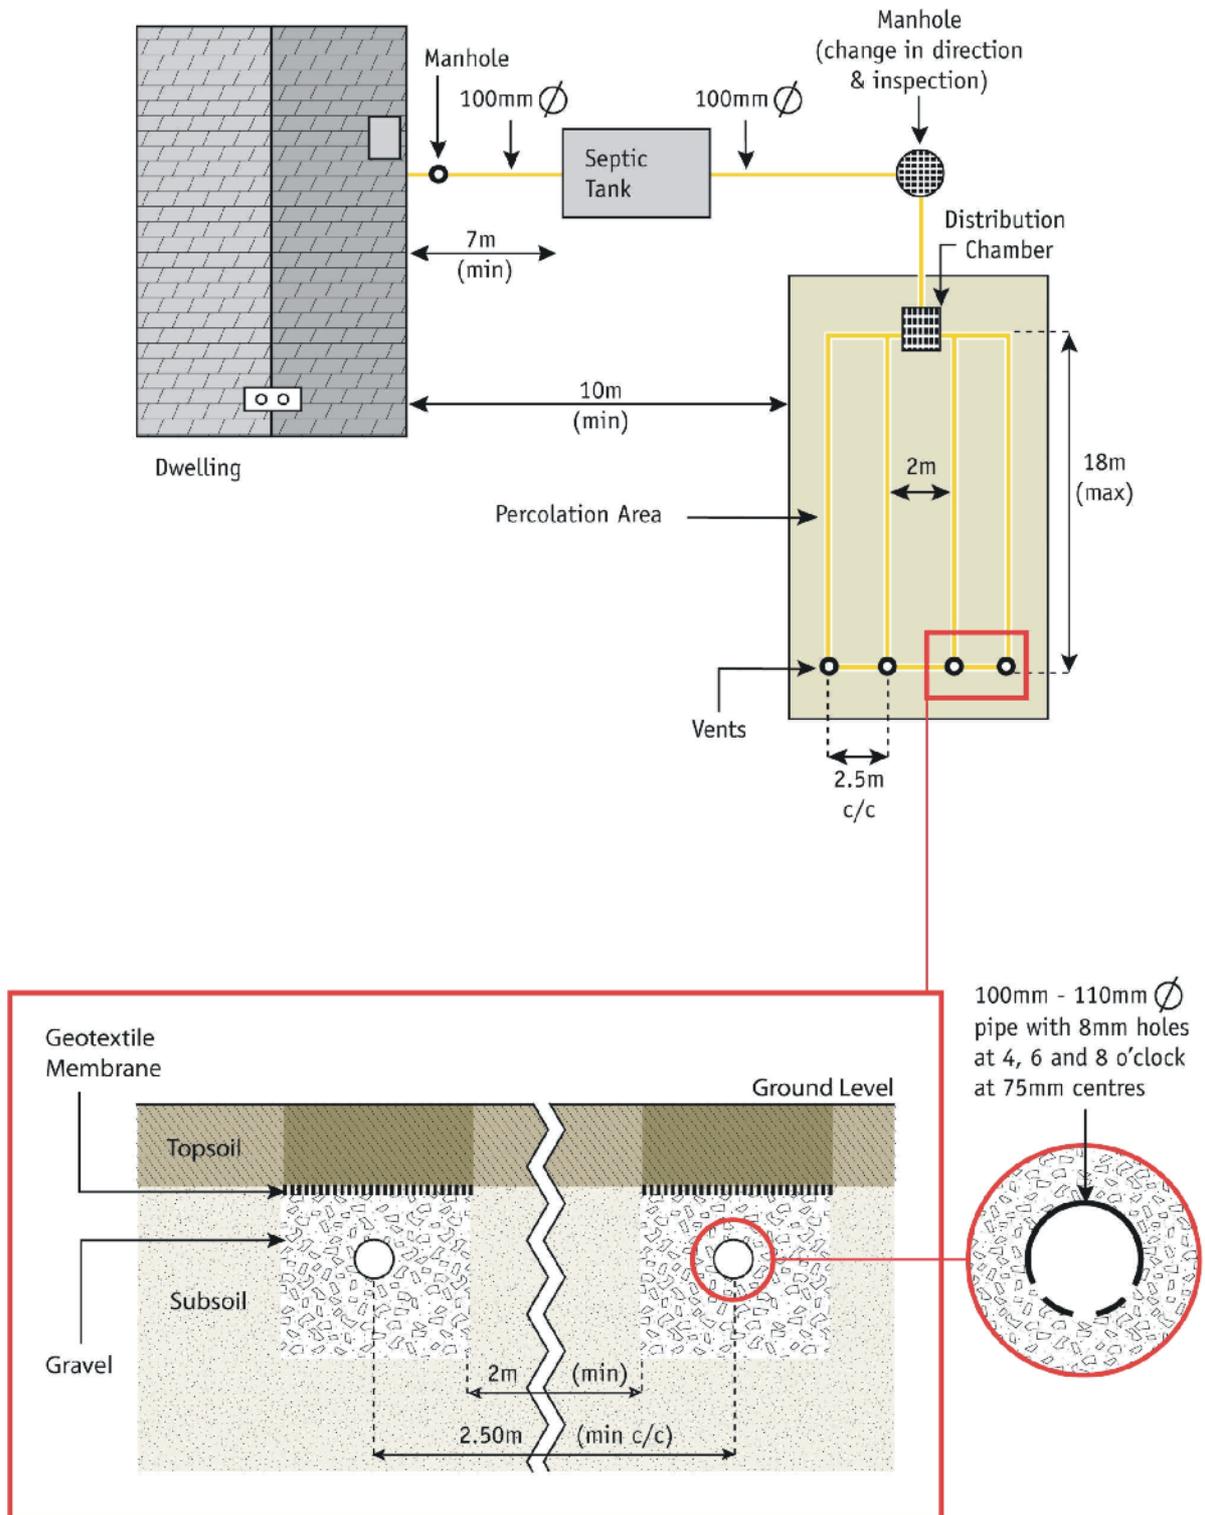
PLAN AND SECTION OF LAYOUT OF SEPTIC TANK SYSTEM.
